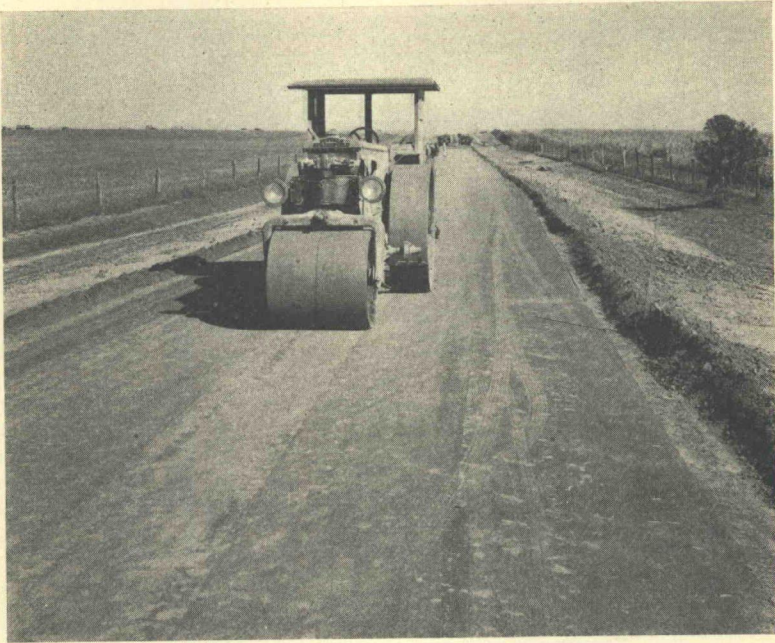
Final compaction with an 8-ton three wheel roller. Illinois photo.
